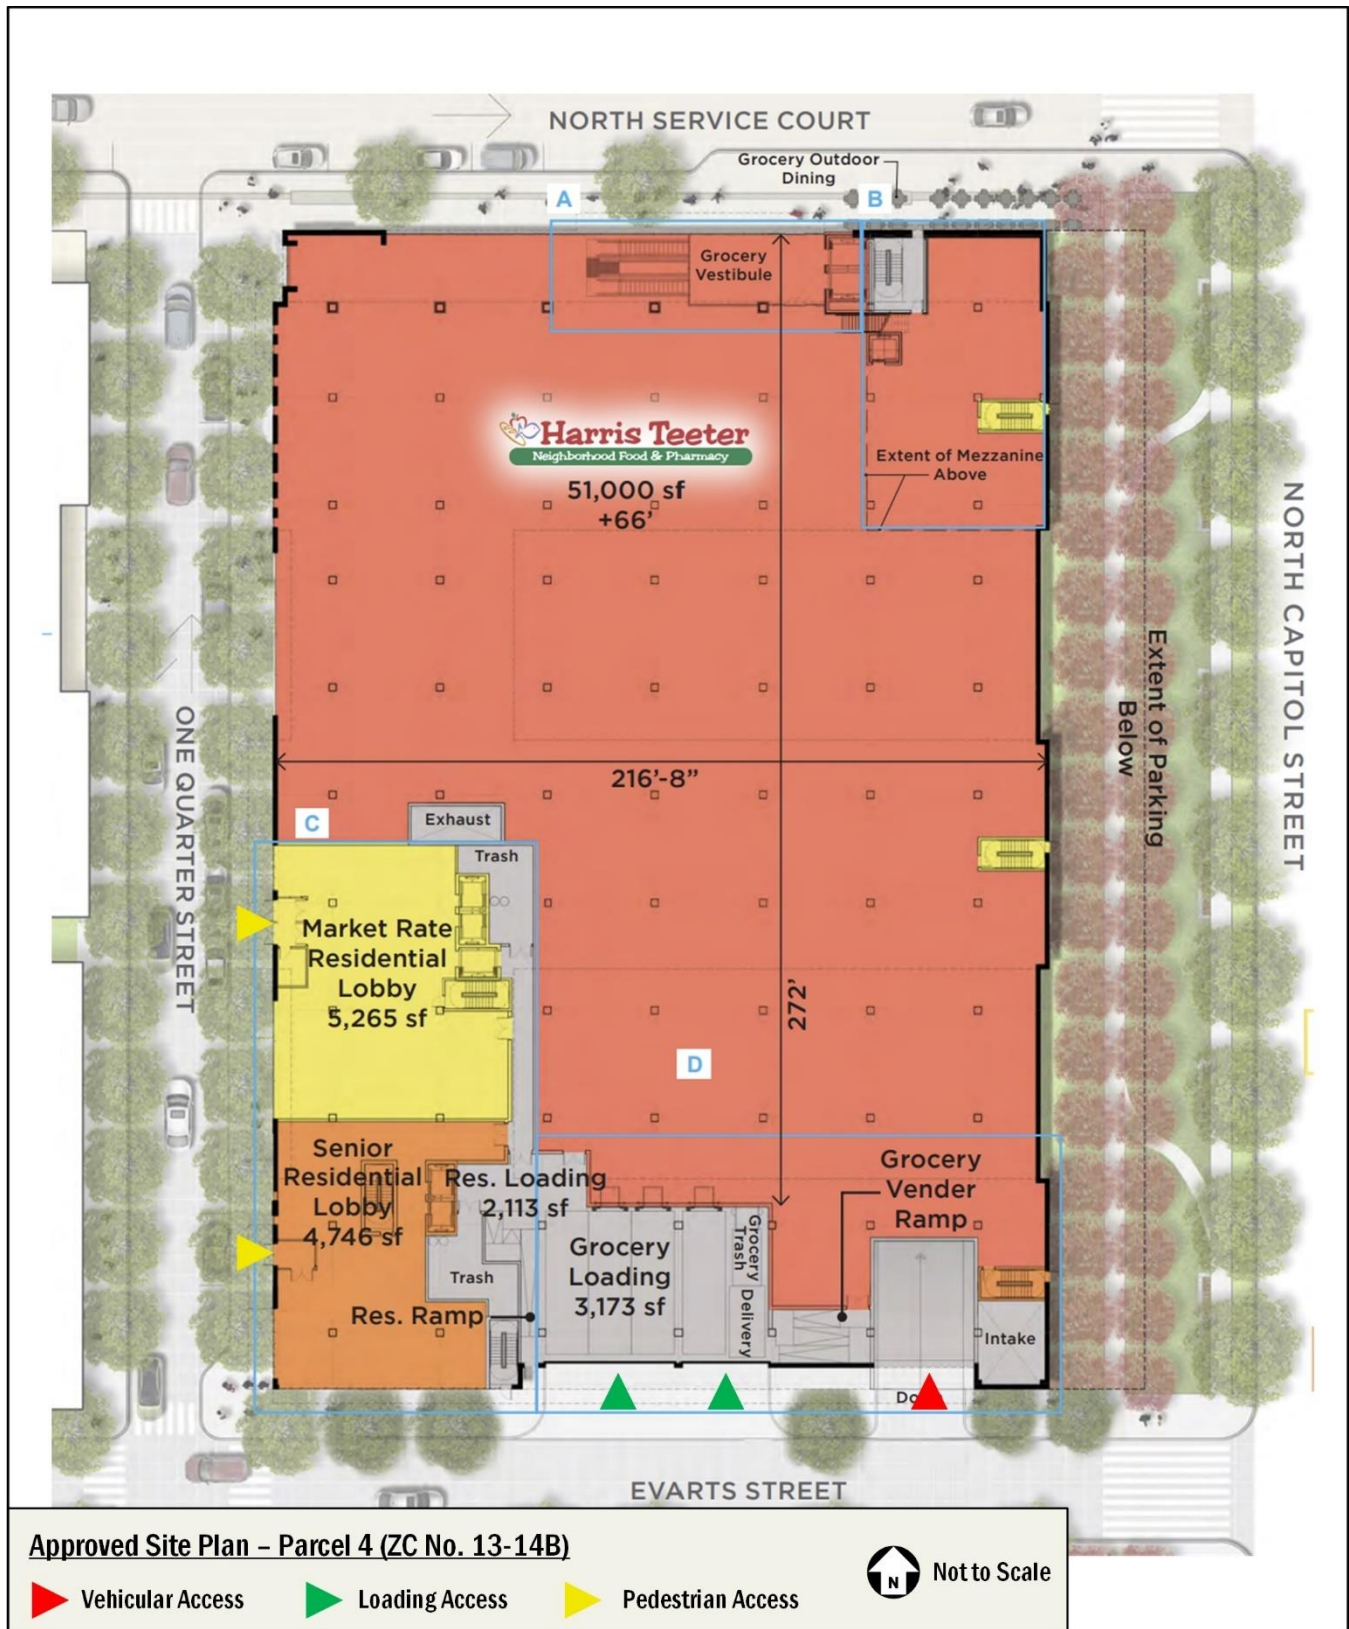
Approved Site Plan – Parcel 4 (ZC No. 13-14B)
